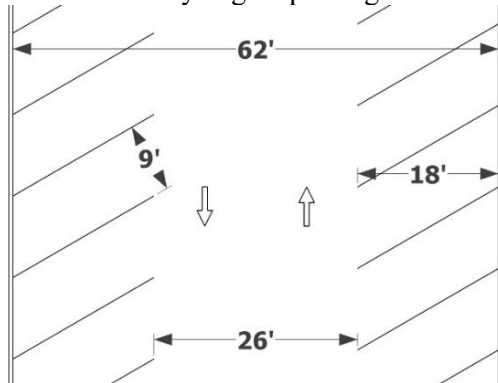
Example of a two-way angled parking module with a 26-foot drive aisle.
